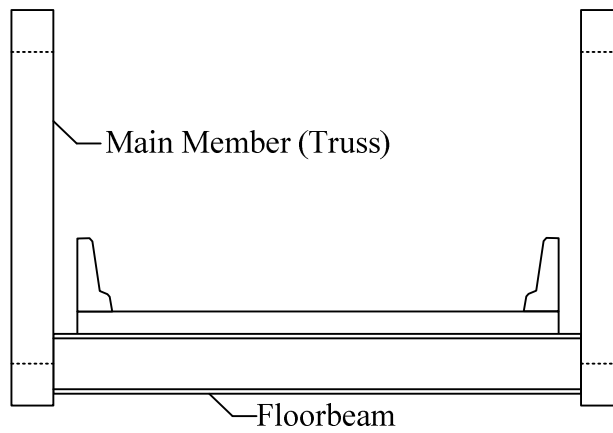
TRUSS-FLOORBEAM SYSTEM (THROUGH)
